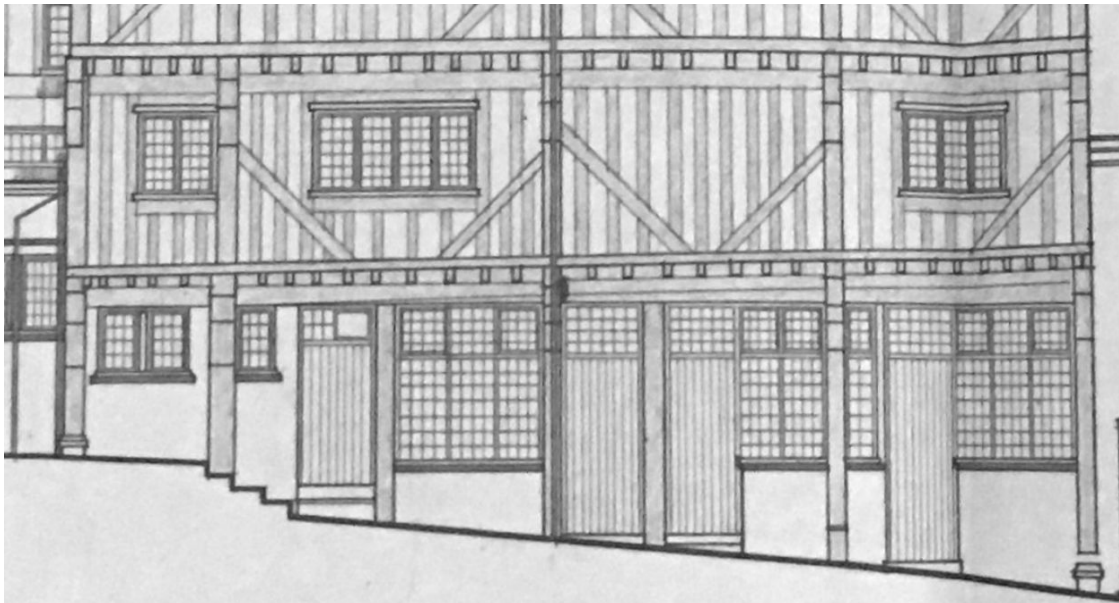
Mid C20 elevation showing the 1925-6 construction, with slightly varying design to Yorke's proposal, but with the series of doors and windows filling the bays.
